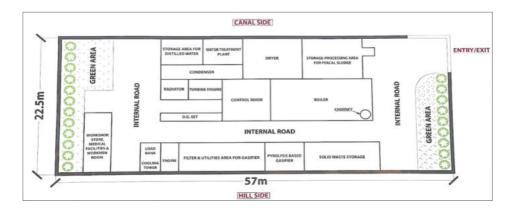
PLANT LAYOUT OF OMNI-PROCESSOR OF CAMP 4E (PHOTO: SURVEY TEAM AT SITE)
